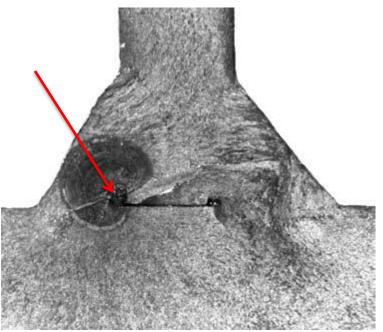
Fracture Surface of I-shaped Cross Section
